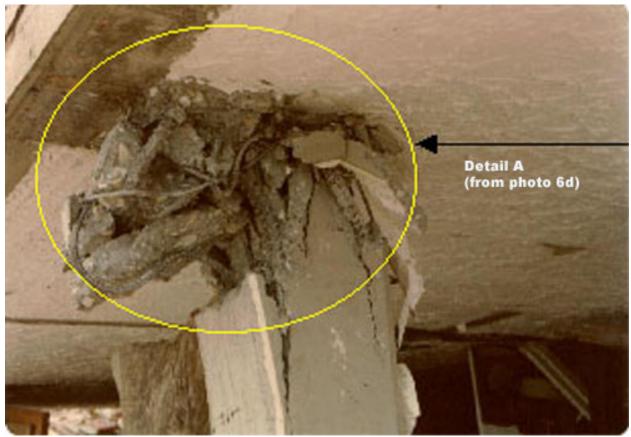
F: Collapsed building; Detail A shows too widely spaced stirrups
